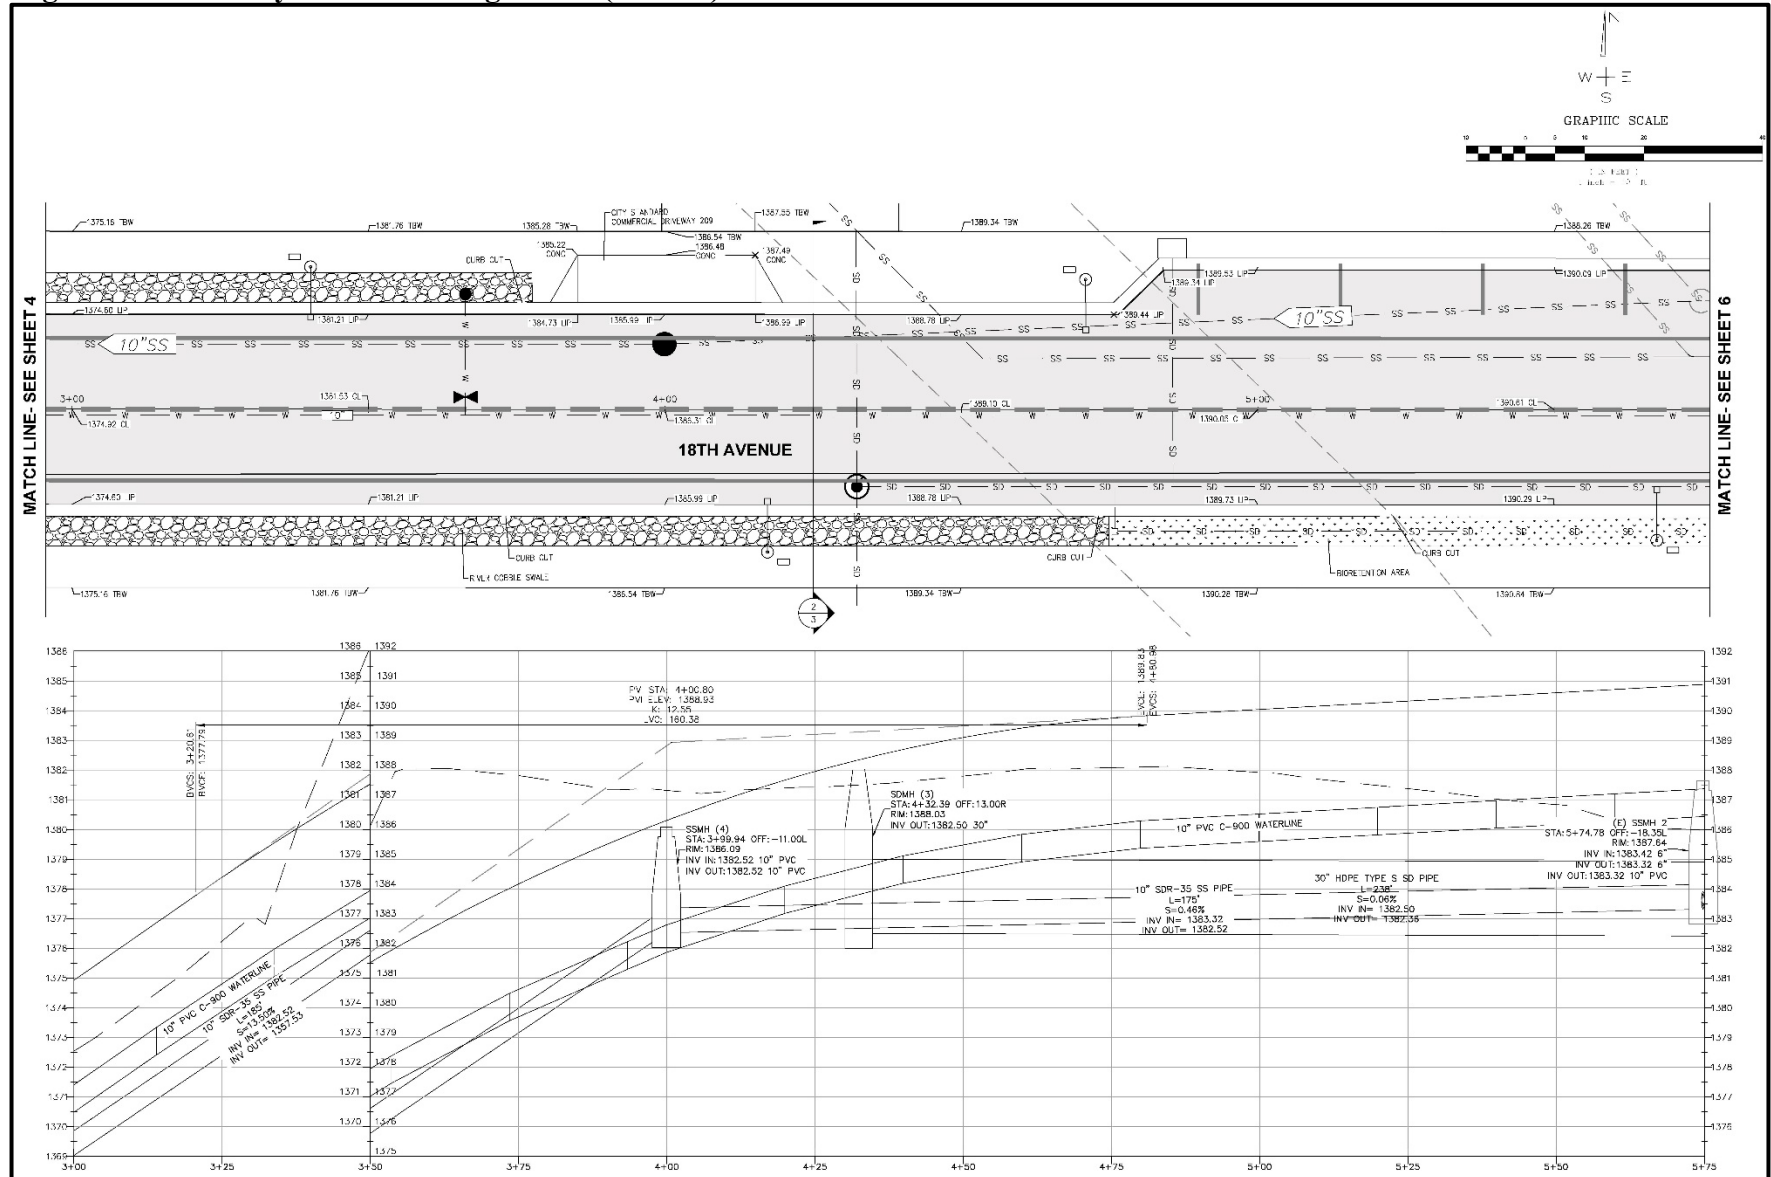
Roadway Site Plan – Segment 3 (Sheet 6)
